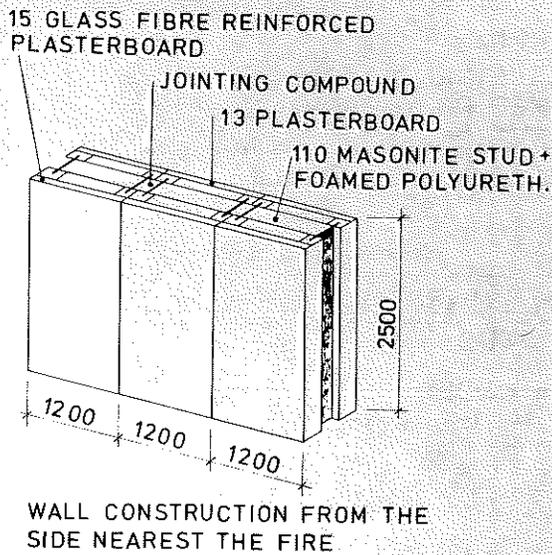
Modified wall construction No 2 subjected to fire test. This wall resisted the fire test for 35 minutes without failure. Wall No 1 subjected to fire test had an inner facing layer of 13 mm glass fibre reinforced plasterboard, and the webs of the masonite studs were 6 mm thick and had not been treated with fire resisting paint. Wall No 1 failed after 27 minutes in the fire test.
